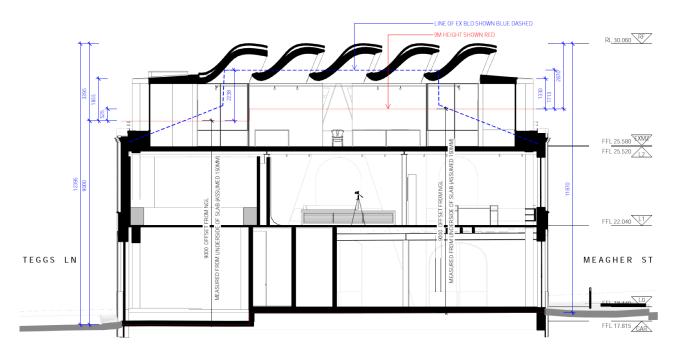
Section showing proposed maximum building height (black) and height of existing building (blue)
